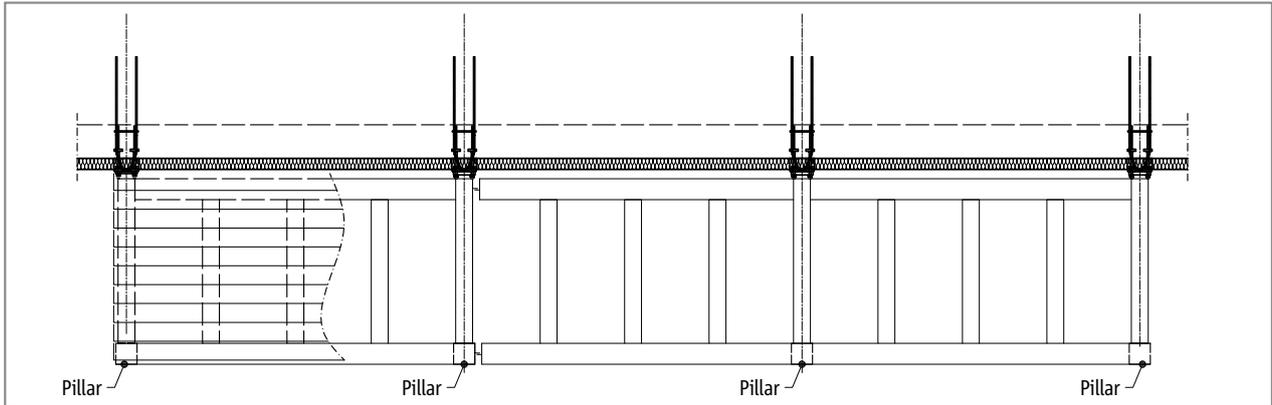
Schöck Isokorb® T type SQ: Pillar supported balcony
